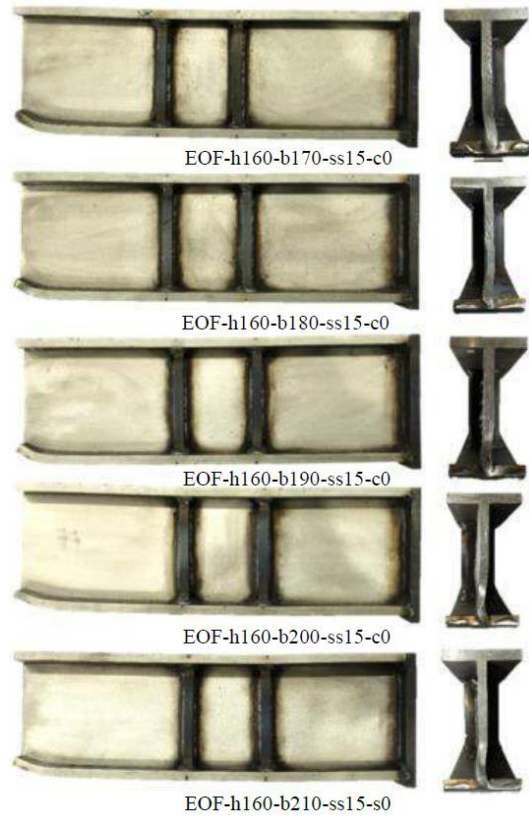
Failure modes of EOF-I160 specimens under end one-flange (EOF) loading [10].
